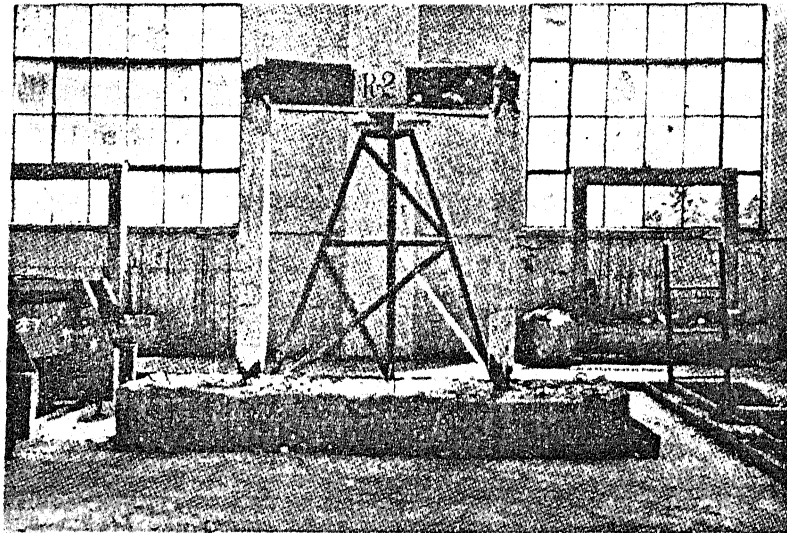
THE PHOTO OF A TEST SPECIMEN
